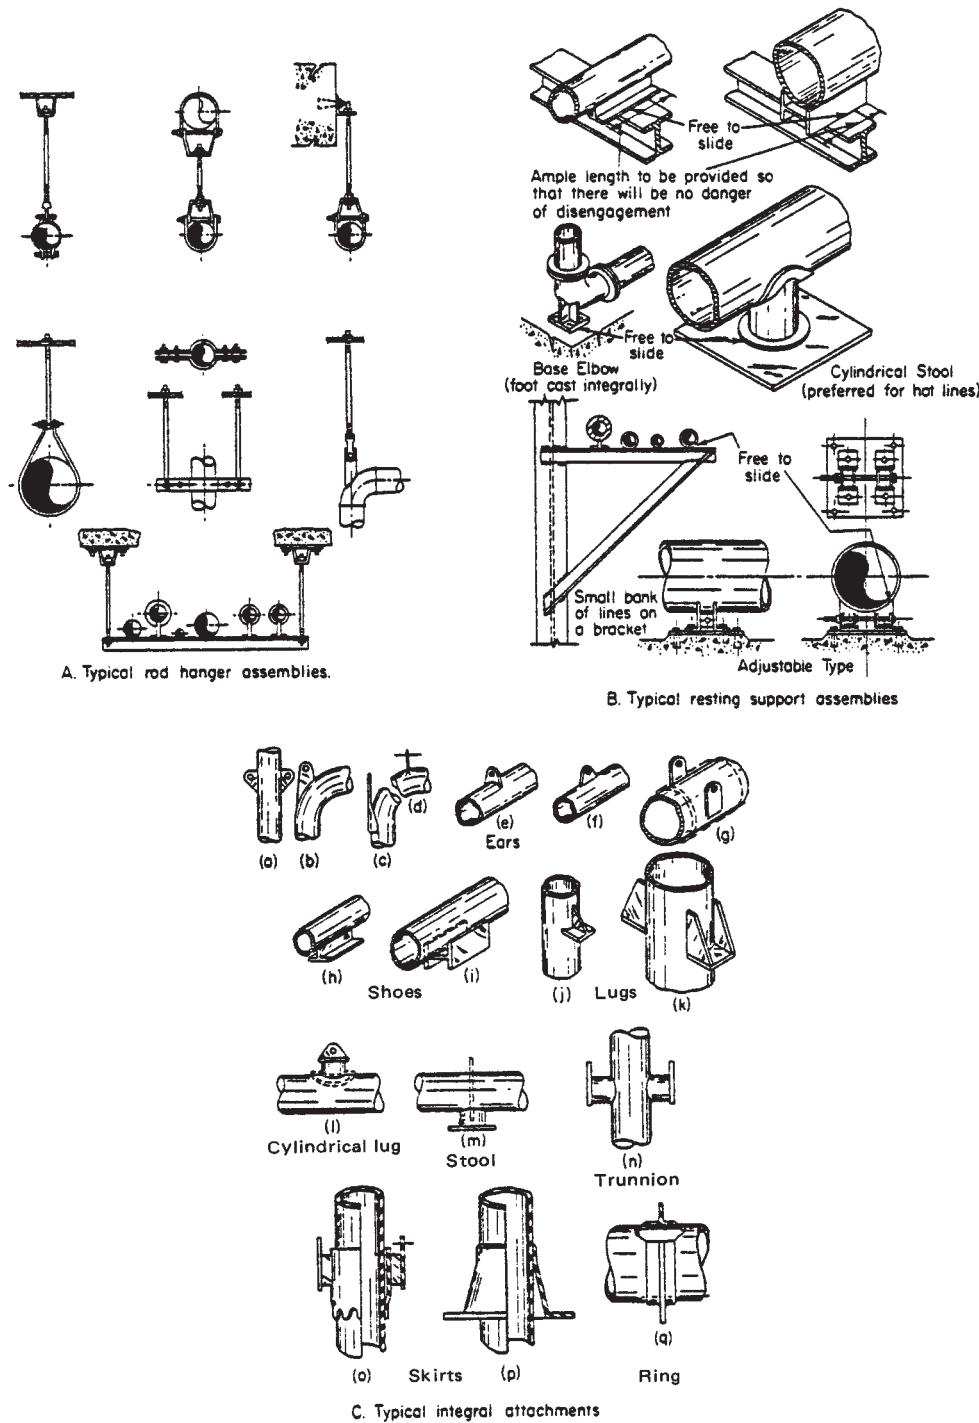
Typical pipe supports and attachments. (From Kellogg, Design of Piping Systems, Wiley, New York, 1965.)
